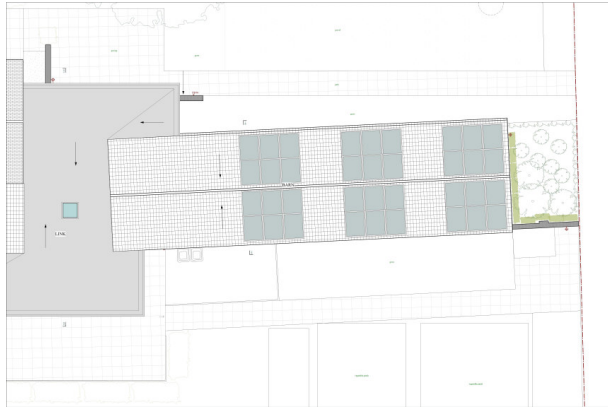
Plan showing the location of the PV Panels as permitted on the barn roof
